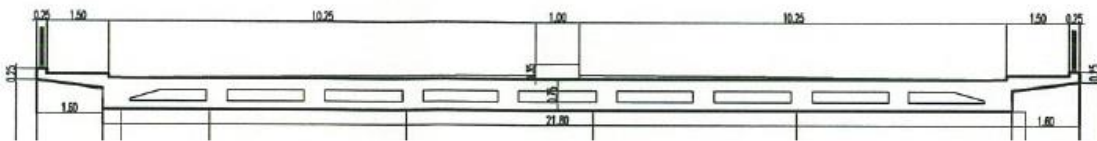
Cross section of arch slab near the hinge (section 2-2)
